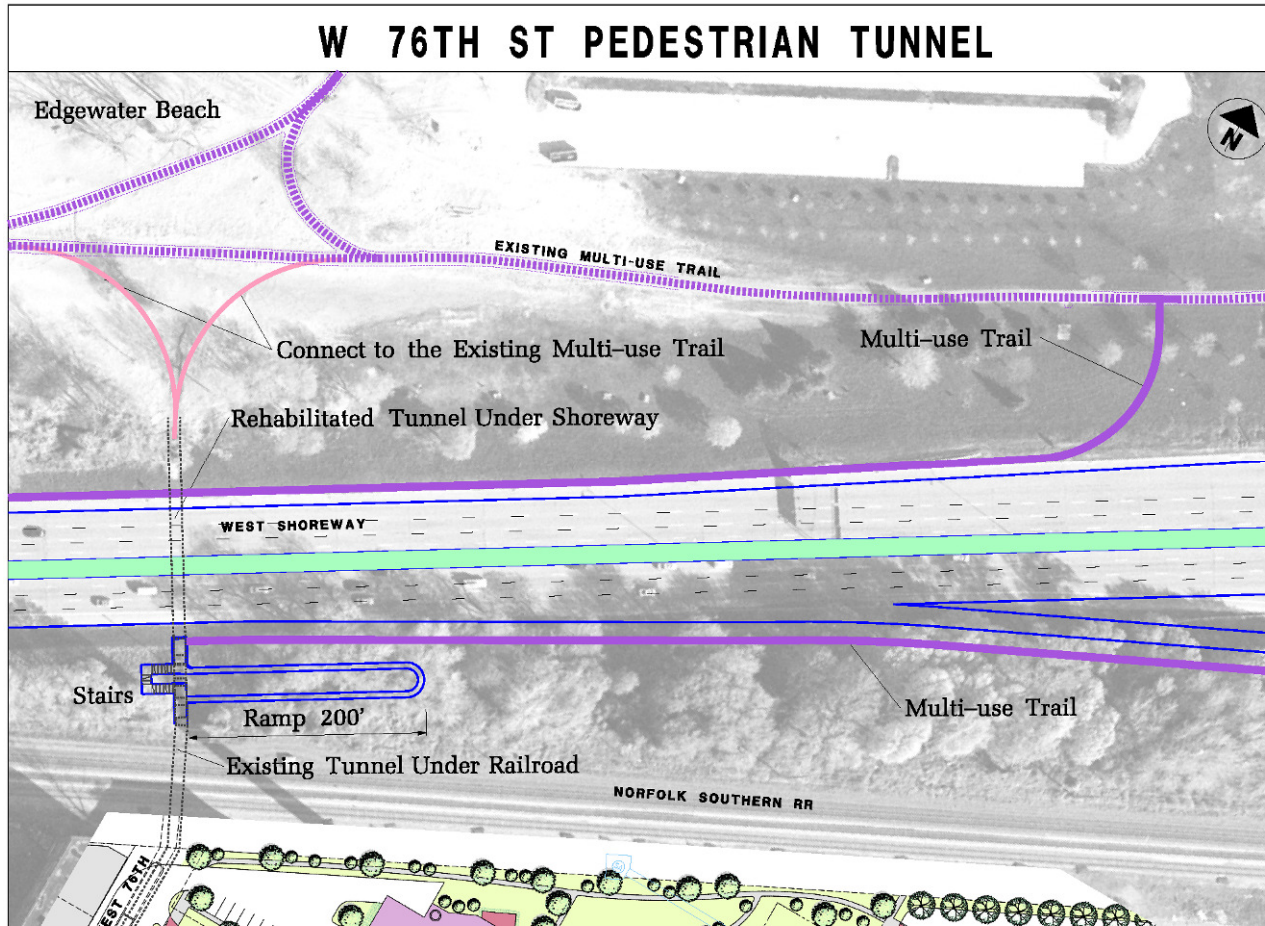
West Shoreway Boulevard W. 76th St. Pedestrian Tunnel
